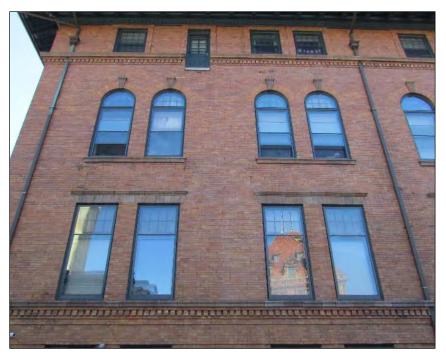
DETAIL OF FENESTRATION, NORTHWEST ELEVATION
